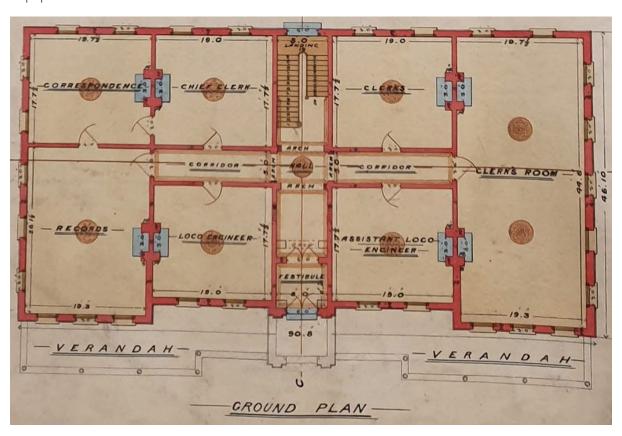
Ground Floor plan of the original 1887 construction of the CME Building. Source: Rappaport & Caldis Cook Group, 1997
